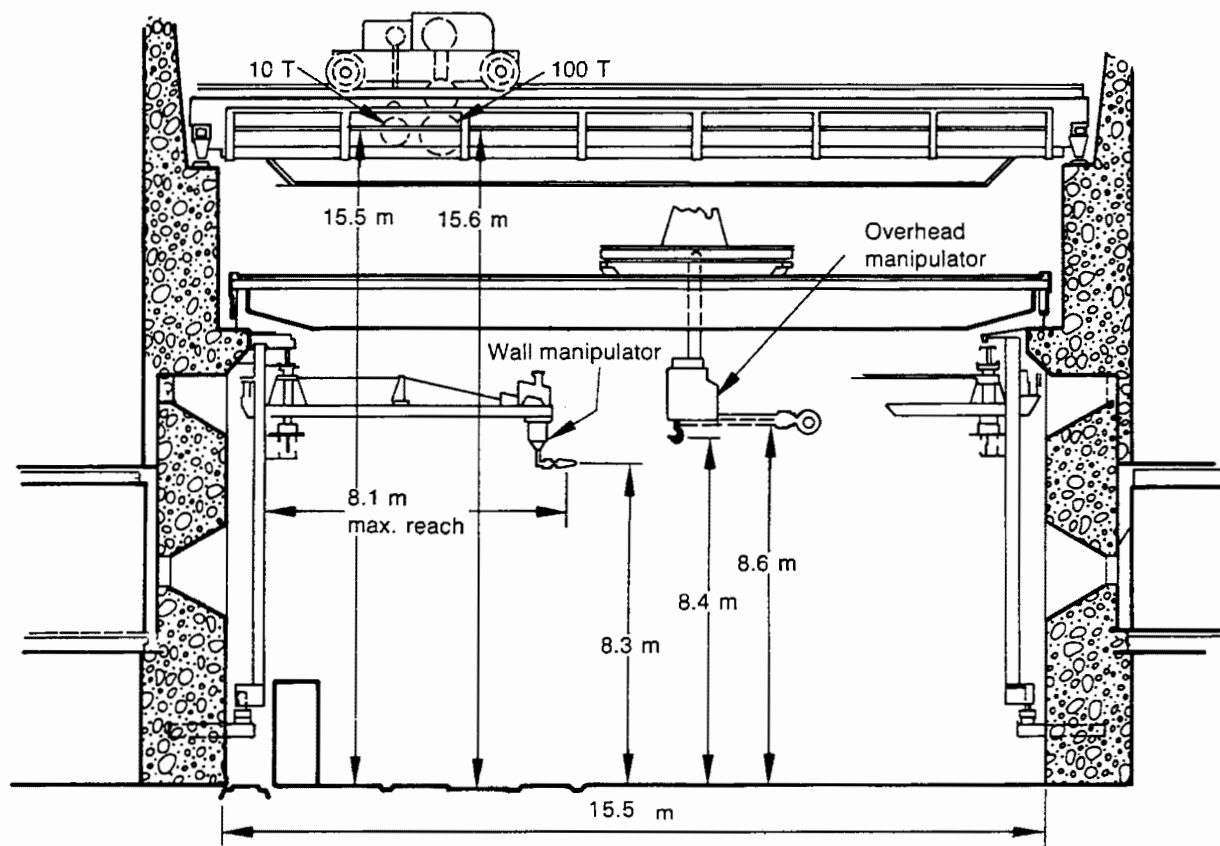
Elevation View of Hot Shop and Handling Equipment
